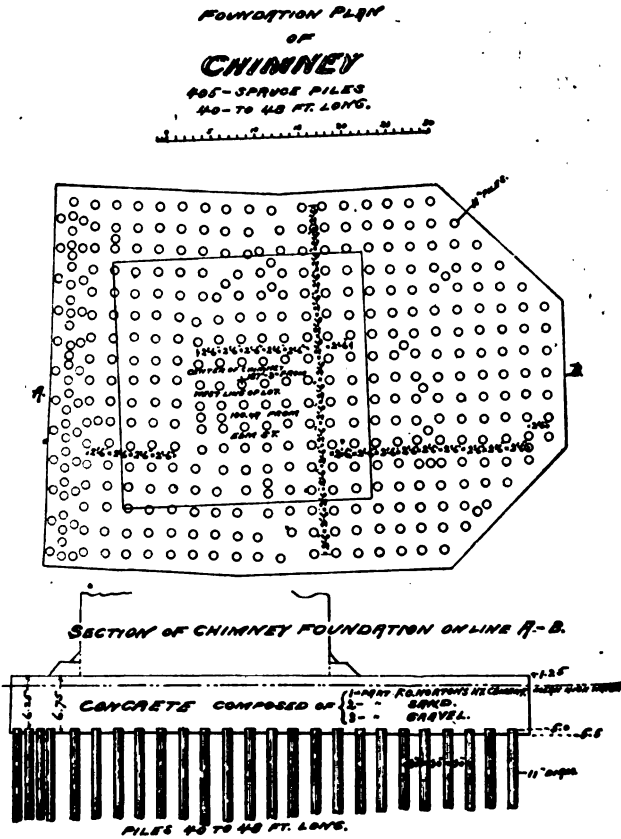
FOUNDATION PLAN OF CHIMNEY.
